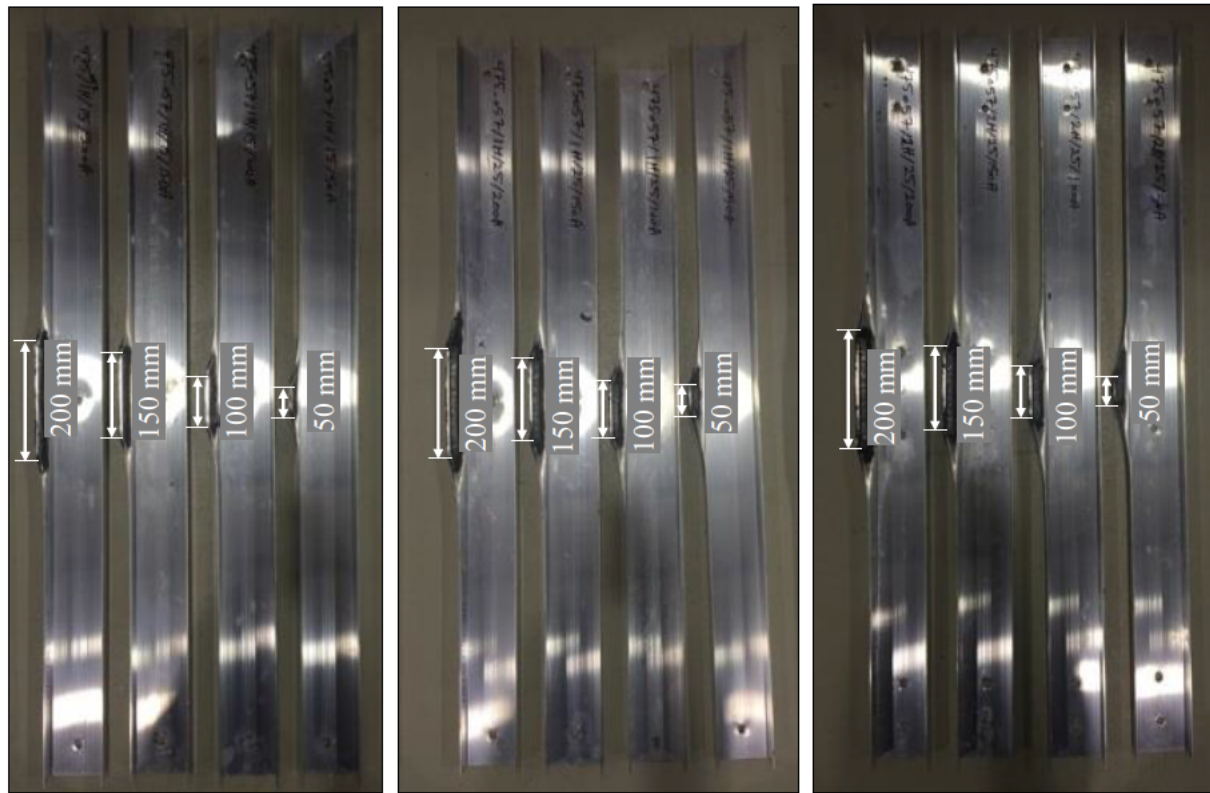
Bearing failure modes of Section 475-057 under different bearing widths.
